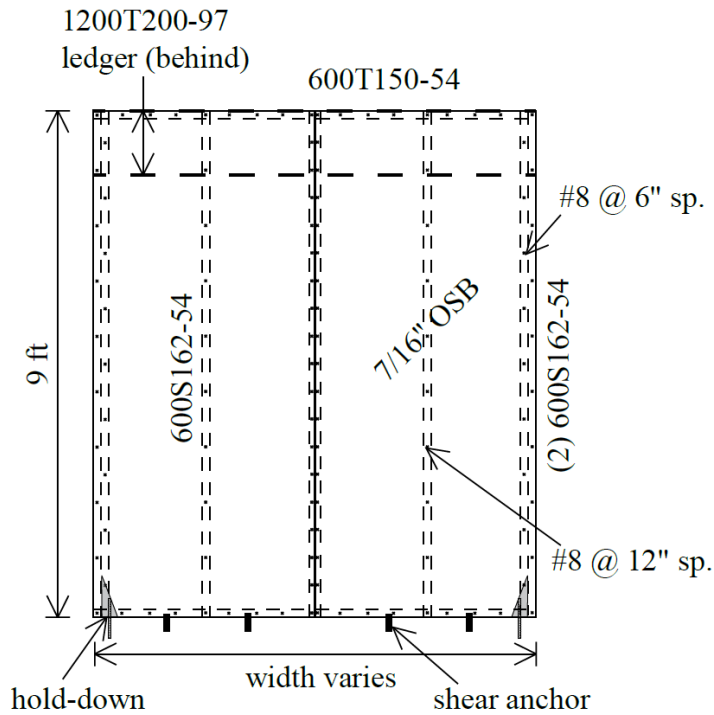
Typical CFS shear wall configuration (Buonopane et al., 2014).
